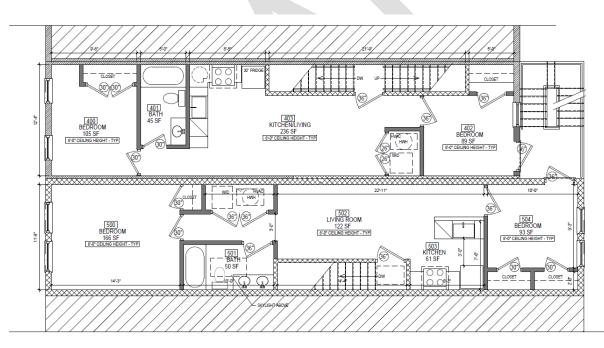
46-48 S. Carrollton Avenue – Proposed third floor plan
